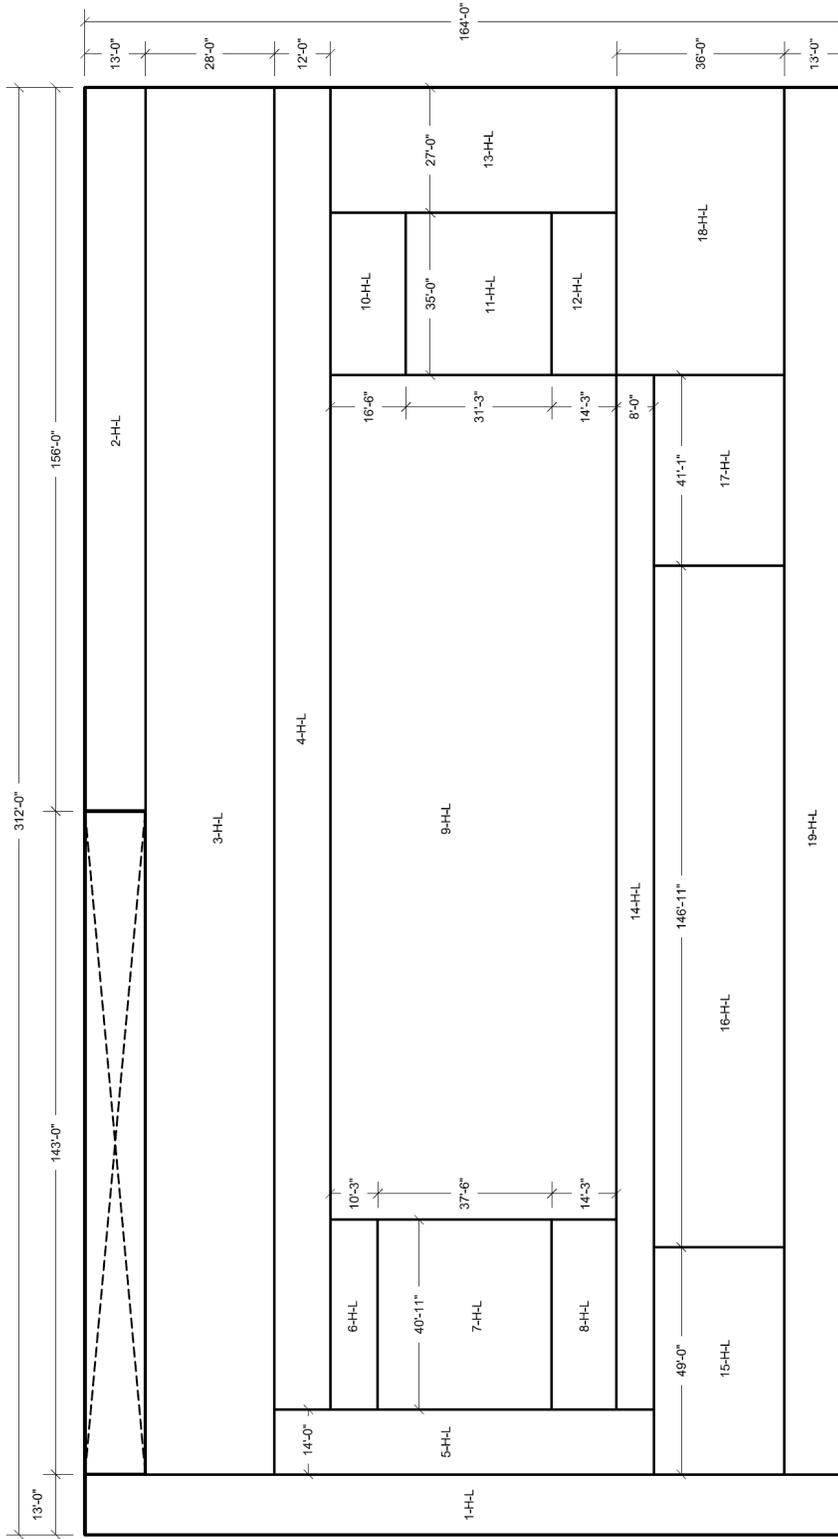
H.6-431: UHS BASIN FOUNDATION MAT
